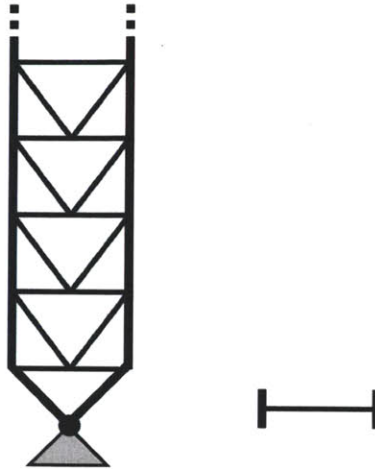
Schematic (a) lower elevation, and (b) plan, of a rocking column, with trussed web
